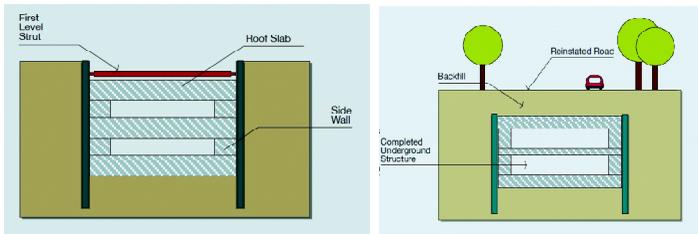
Construction of Underground structure Fig. 22.08: Back filling and Reinstatement
